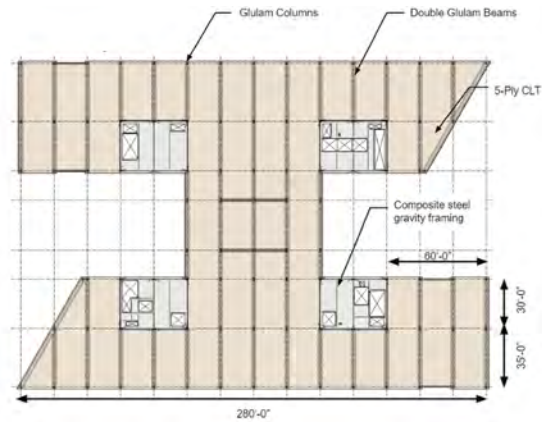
COB3 hybrid structural frame with concrete (Grey) and timber (Brown).
